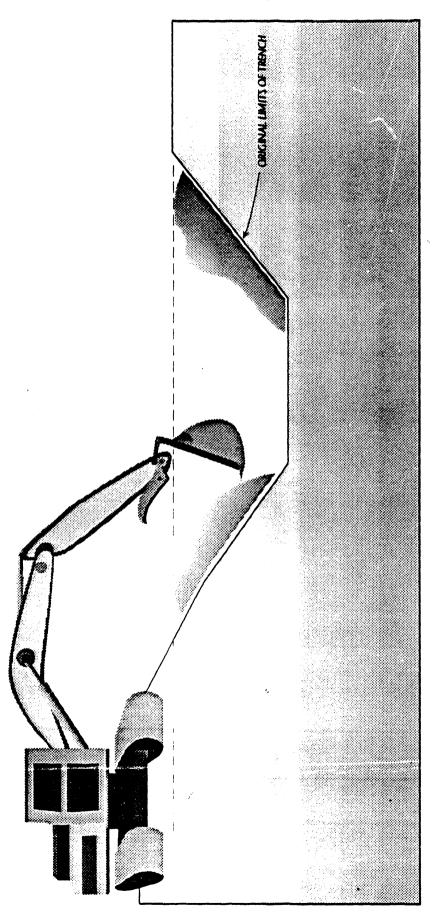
TOP-DOWN EXCAVATION APPROACH - BESIDE TRENCH
